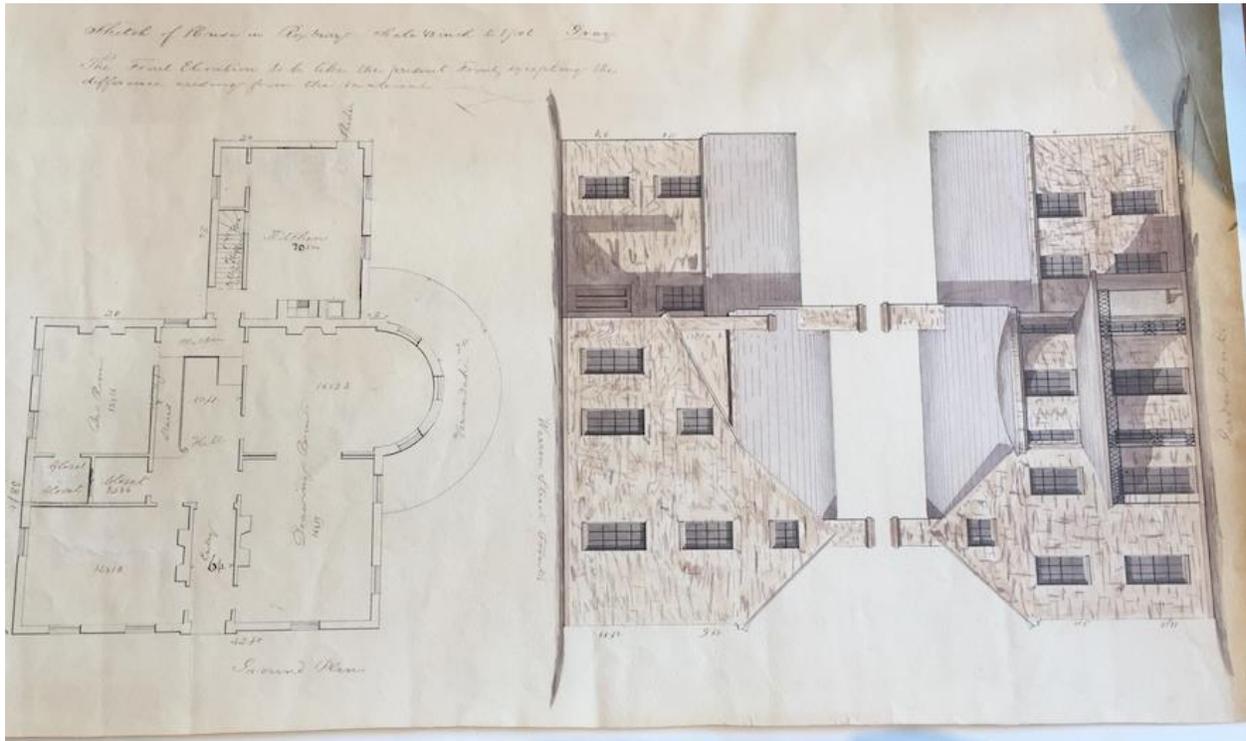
Figure H: Sketch of the new Warren House II, 1846, Plans and drawings for the Warren Estate, Roxbury, Mass, MHS.
